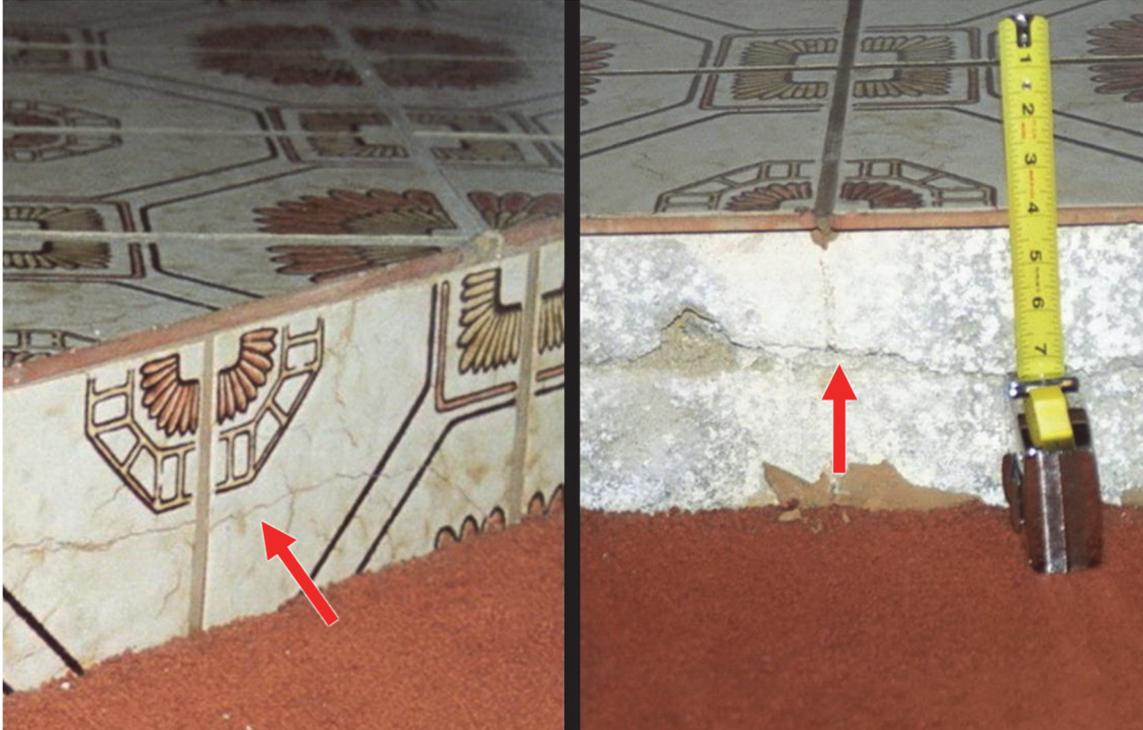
Earthquake-induced cracking of ceramic tile spanning the cold joint between the floor slab and the stemwall in a two-pour system (photo credit: Exponent).
